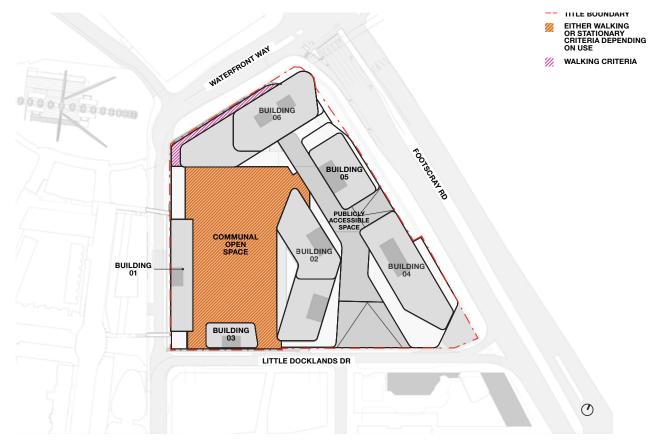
Concept Plan 16 - Wind standards, Elevated Communal Open Space
